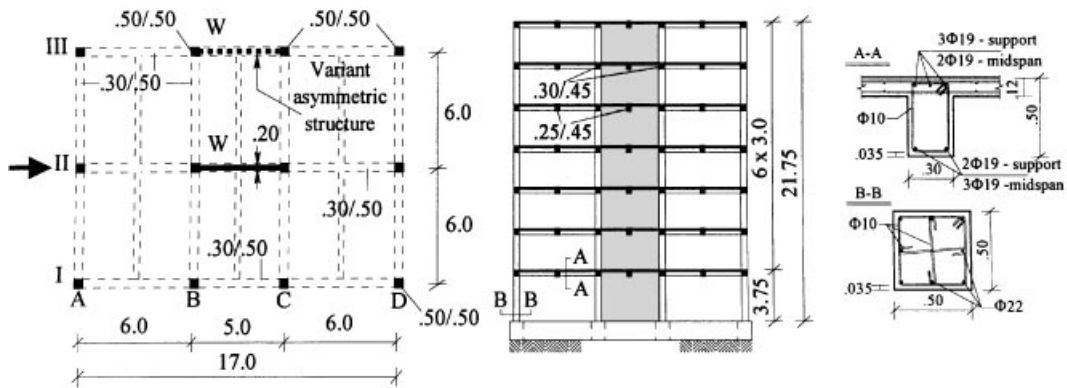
Plan, elevation and typical cross-sections of structural members of the seven-storey buildings
